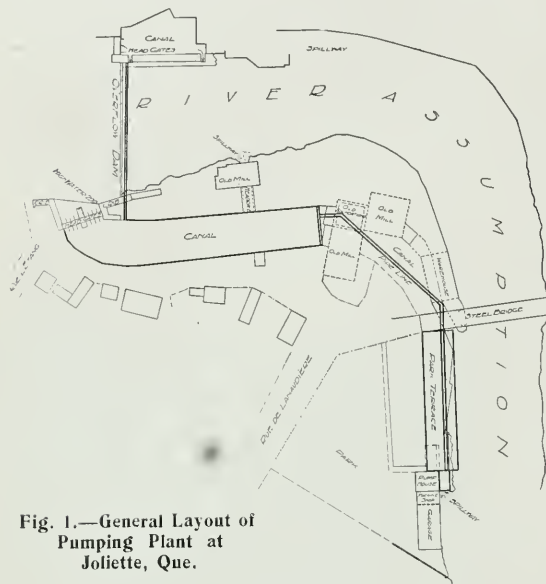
General Layout of Pumping Plant at Joliette, Que.
